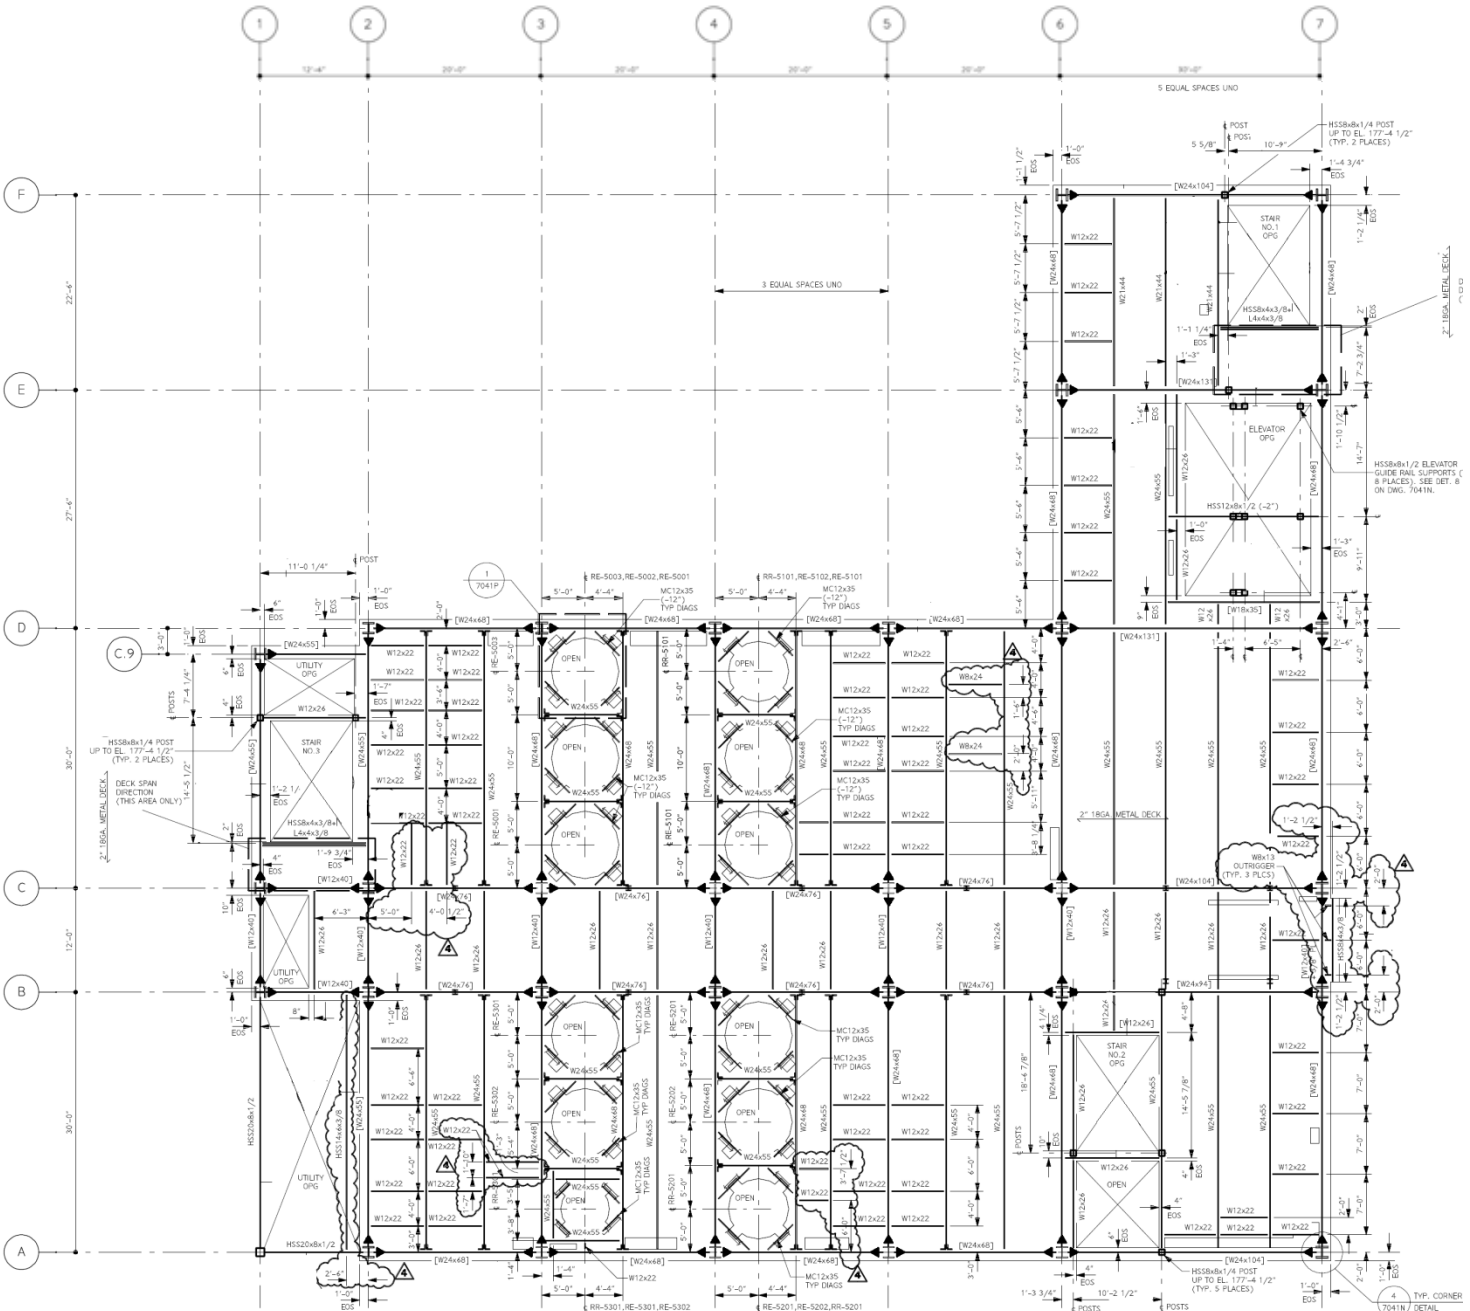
Courtesy of Project Engineer. The fourth floor framing plan.
